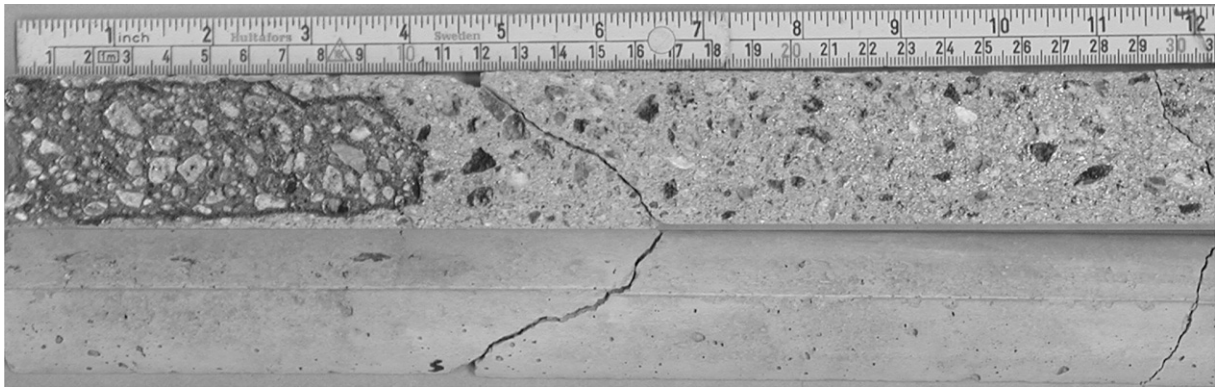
Flow profiles (upper) and pipe wall surface (lower) Mix 4 — steel, $v = 0.2$ m/s.
